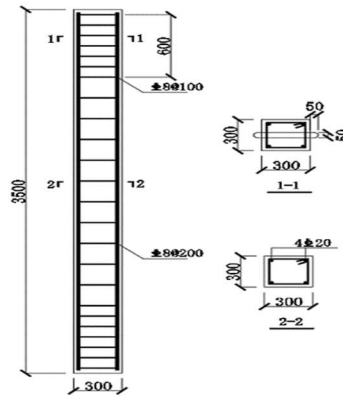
Cross-sectional dimensions and reinforcement of test columns
